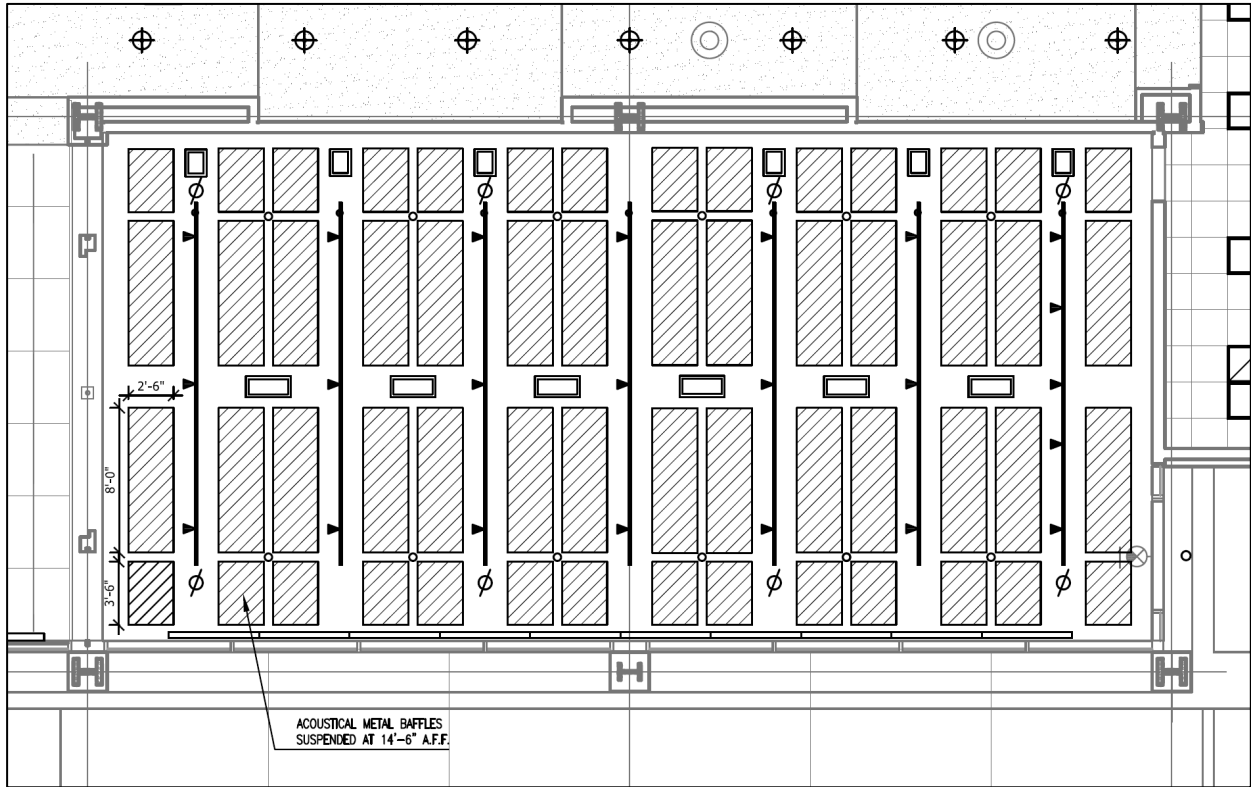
| Music Café Reflected Ceiling Plan – New Design
